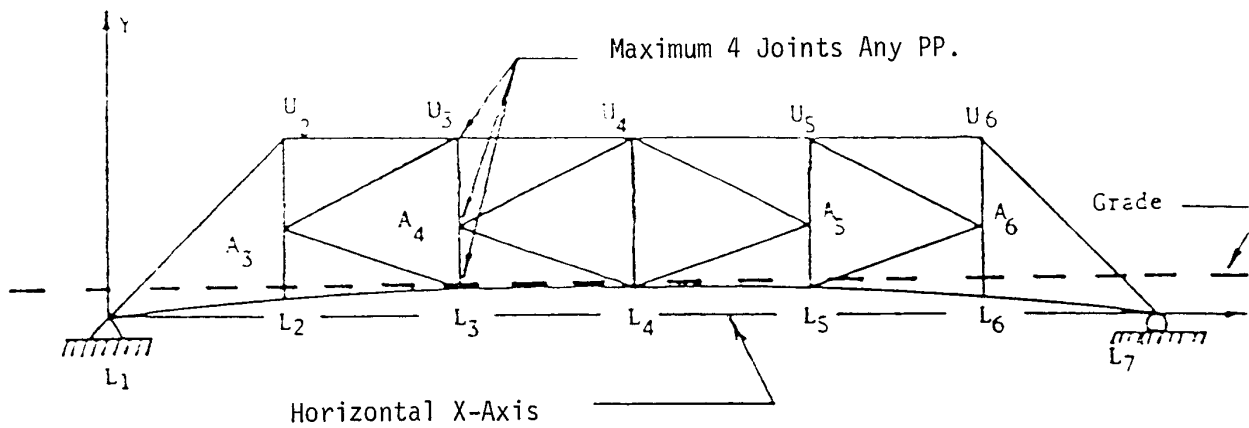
HIGHWAY BRIDGE TRUSS NOMENCLATURE
